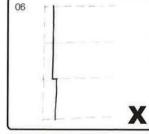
f: Seawalls should mediate in plan between adjoining conditions. At no point should a seawall create a physical step in plan.(I)
